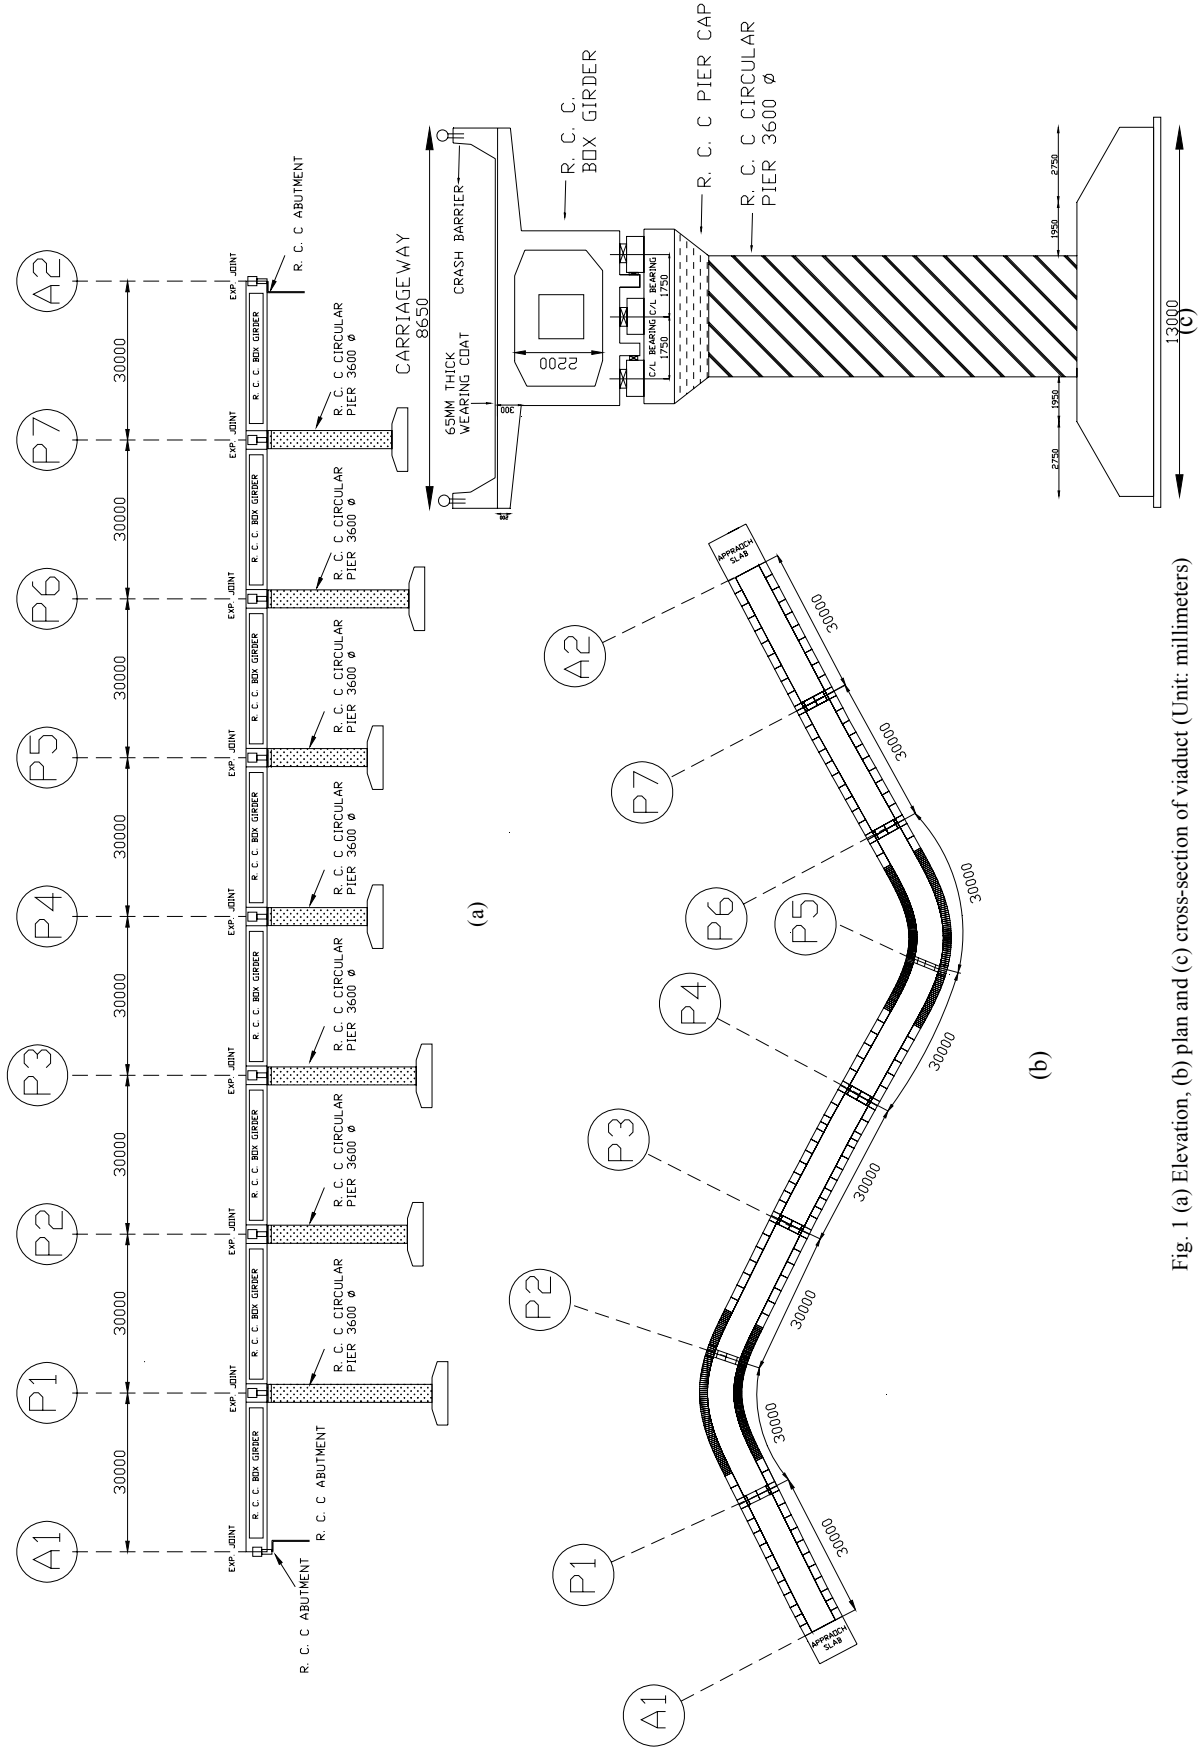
(a) Elevation, (b) plan and (c) cross-section of viaduct (Unit: millimeters)
